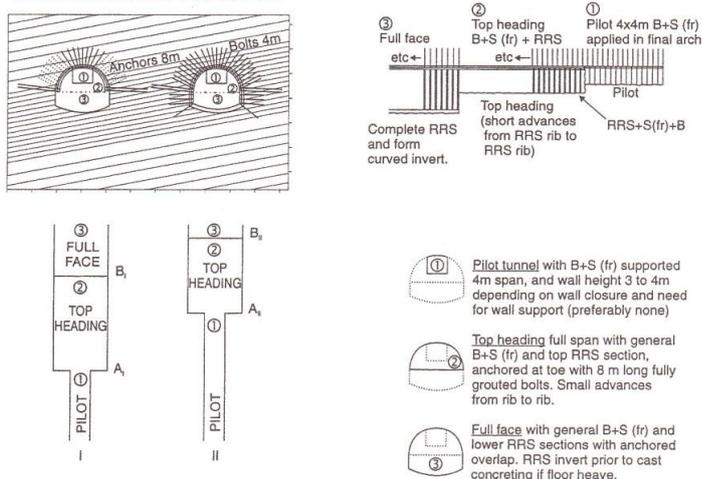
Cross section and plan view of the the twin tunnels, showing the originally suggested excavation sequence (with pilot tunnel).
